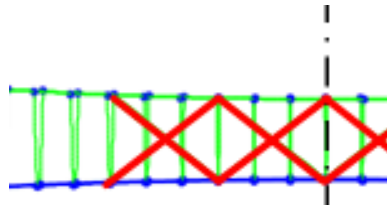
Vertical Bracing Pattern at Center of 60 m Span Footbridge
